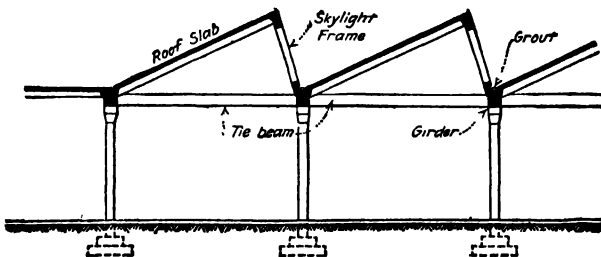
Cross-section showing typical arrangement of units in sawtooth construction, Unit-bill system.
